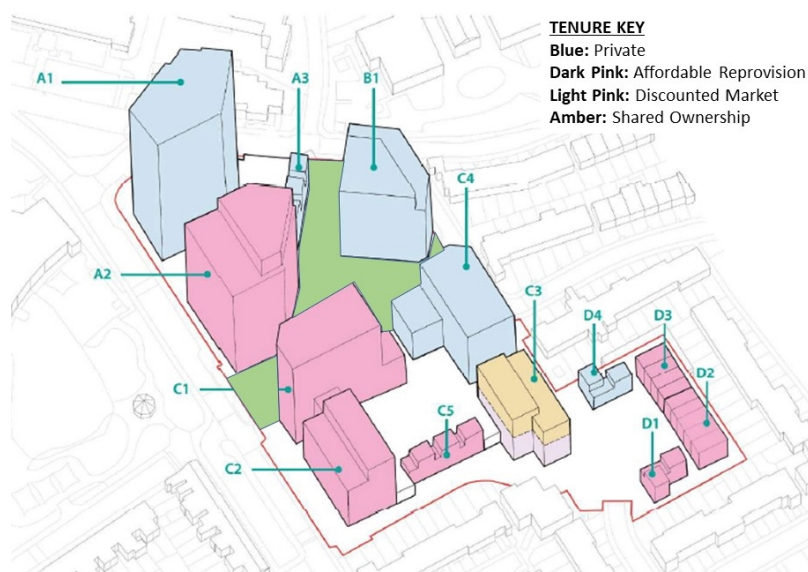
Proposed Blocks Location and Tenure; and the new public realm highlighted in green
